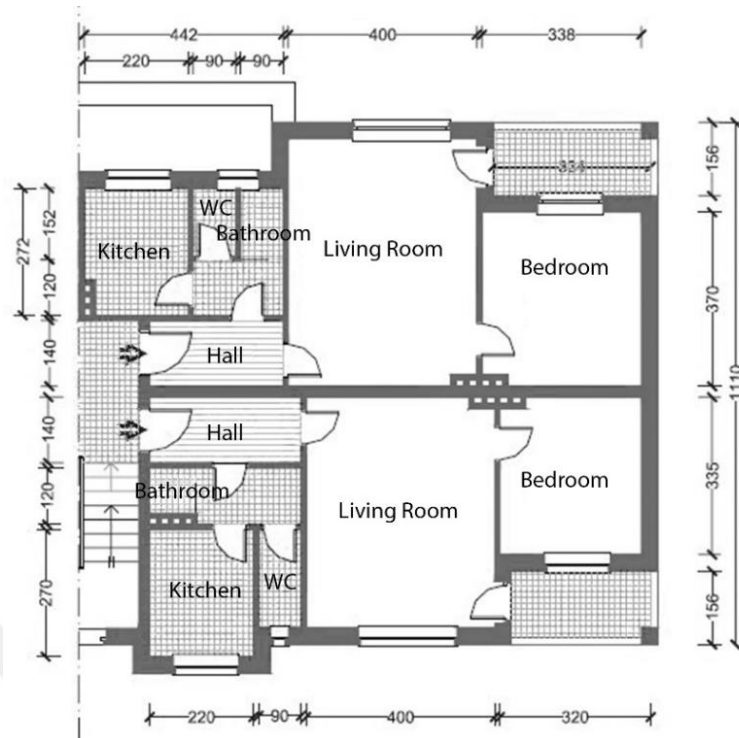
Type 3 Floor Plan (Redrawn with additional information by Merve Köz, original plans from Asiliskender, 2002, p. 85).
